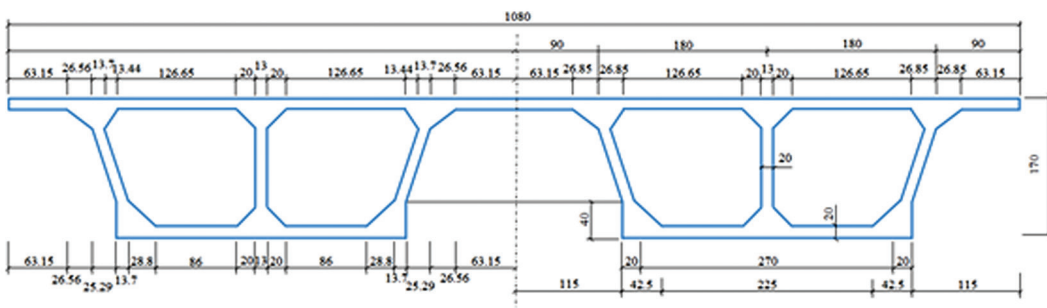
Overall layout and cross section of the Wanjiang Bridge (unit: cm)
